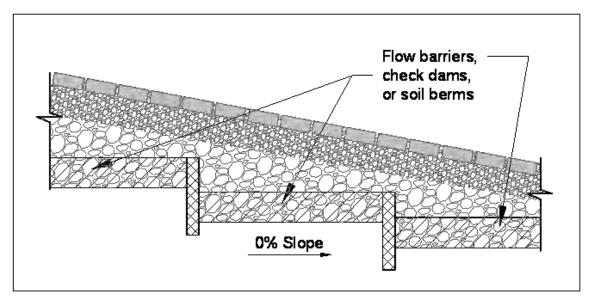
Use of flow barriers to encourage infiltration on sloped sites.
